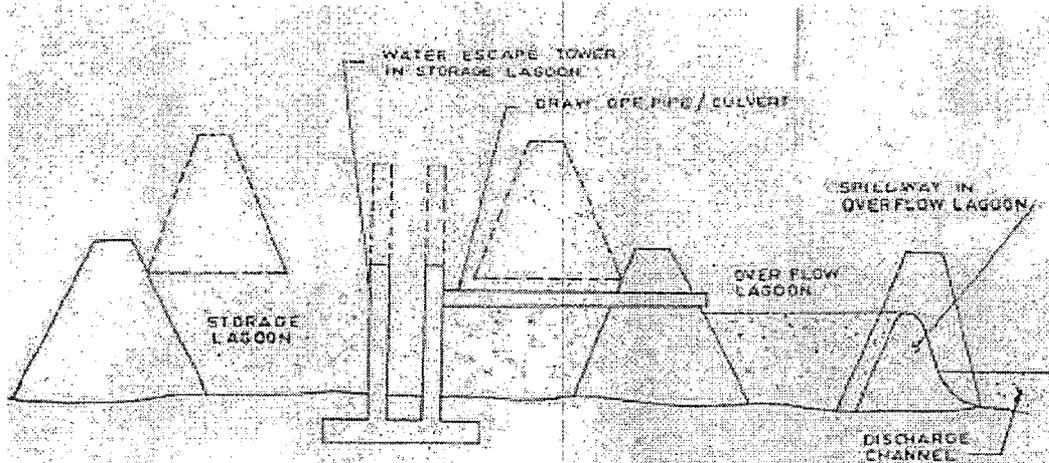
TYPICAL WATER ESCAPE STRUCTURE
